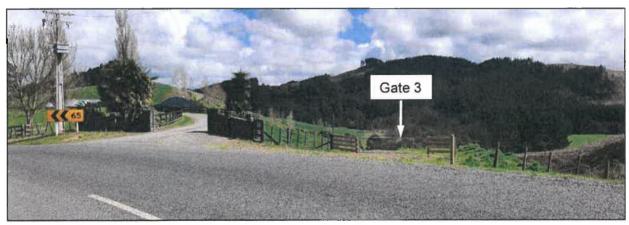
Looking towards 57 Whitehall Road and Gate 3
